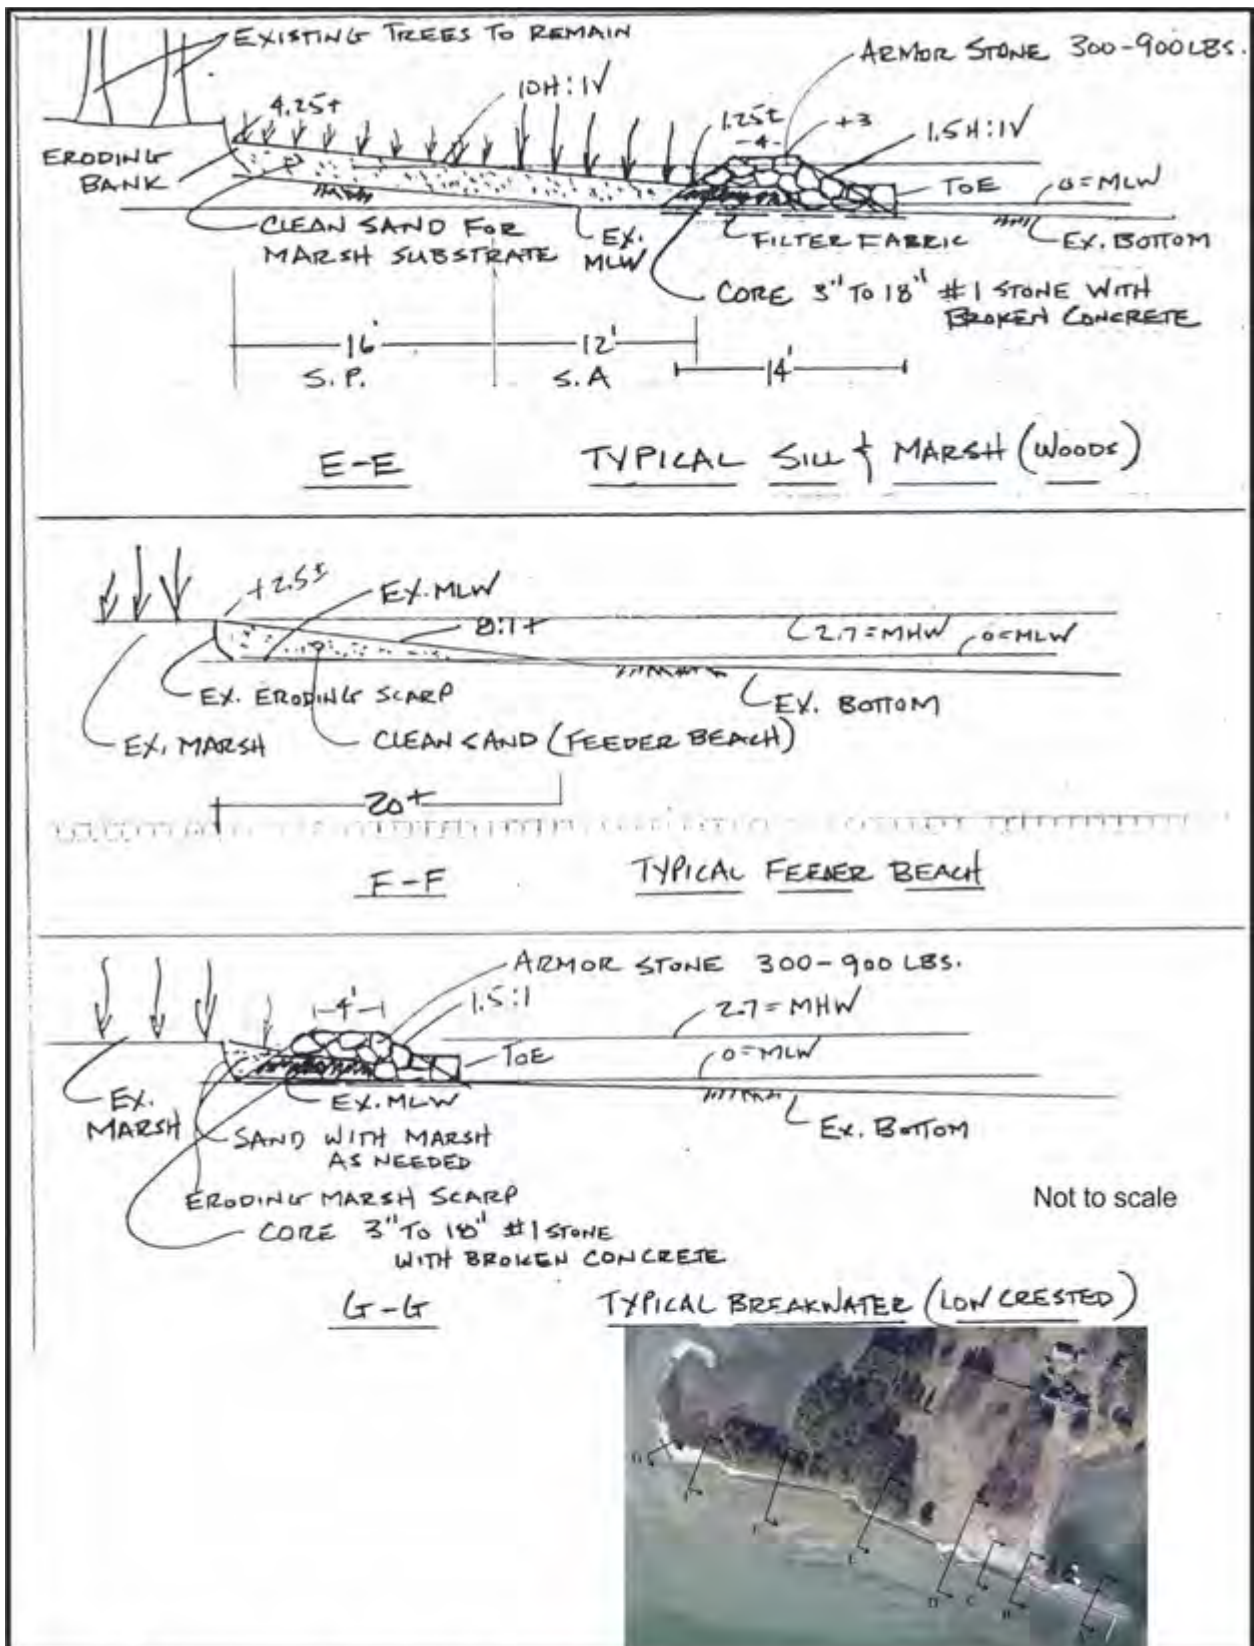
Typical cross-sections of the Poplar Grove shore protection system including the revetment, sill and marsh and pocket beach. Permit drawings by Coastal Design & Construction, Inc.
